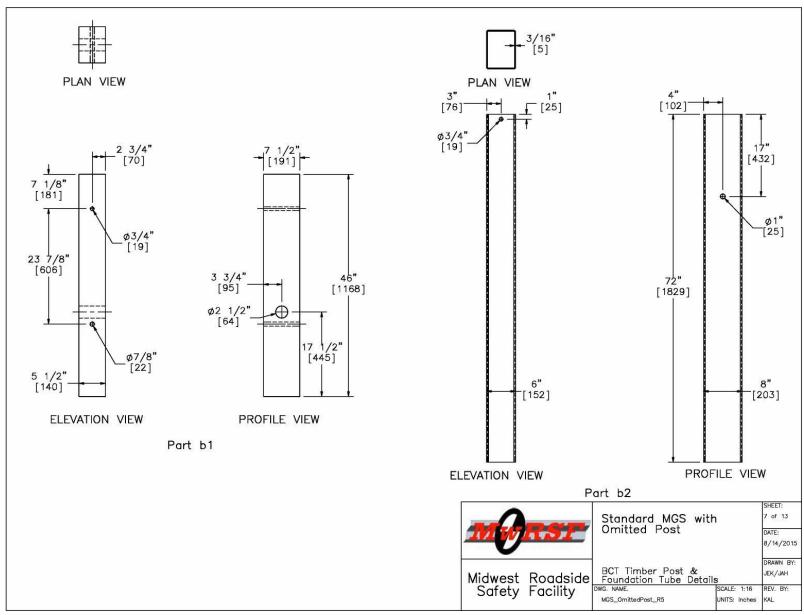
BCT Timber Post and Foundation Tube Details, Test No. MGSMP-1
